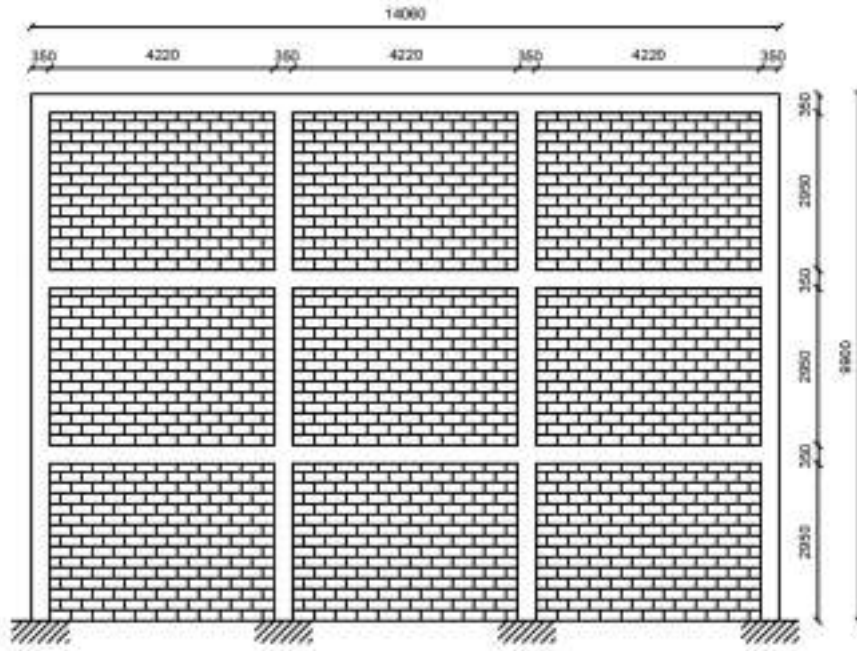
Illustration of the case study of a three story masonry infilled reinforced concrete frame.
